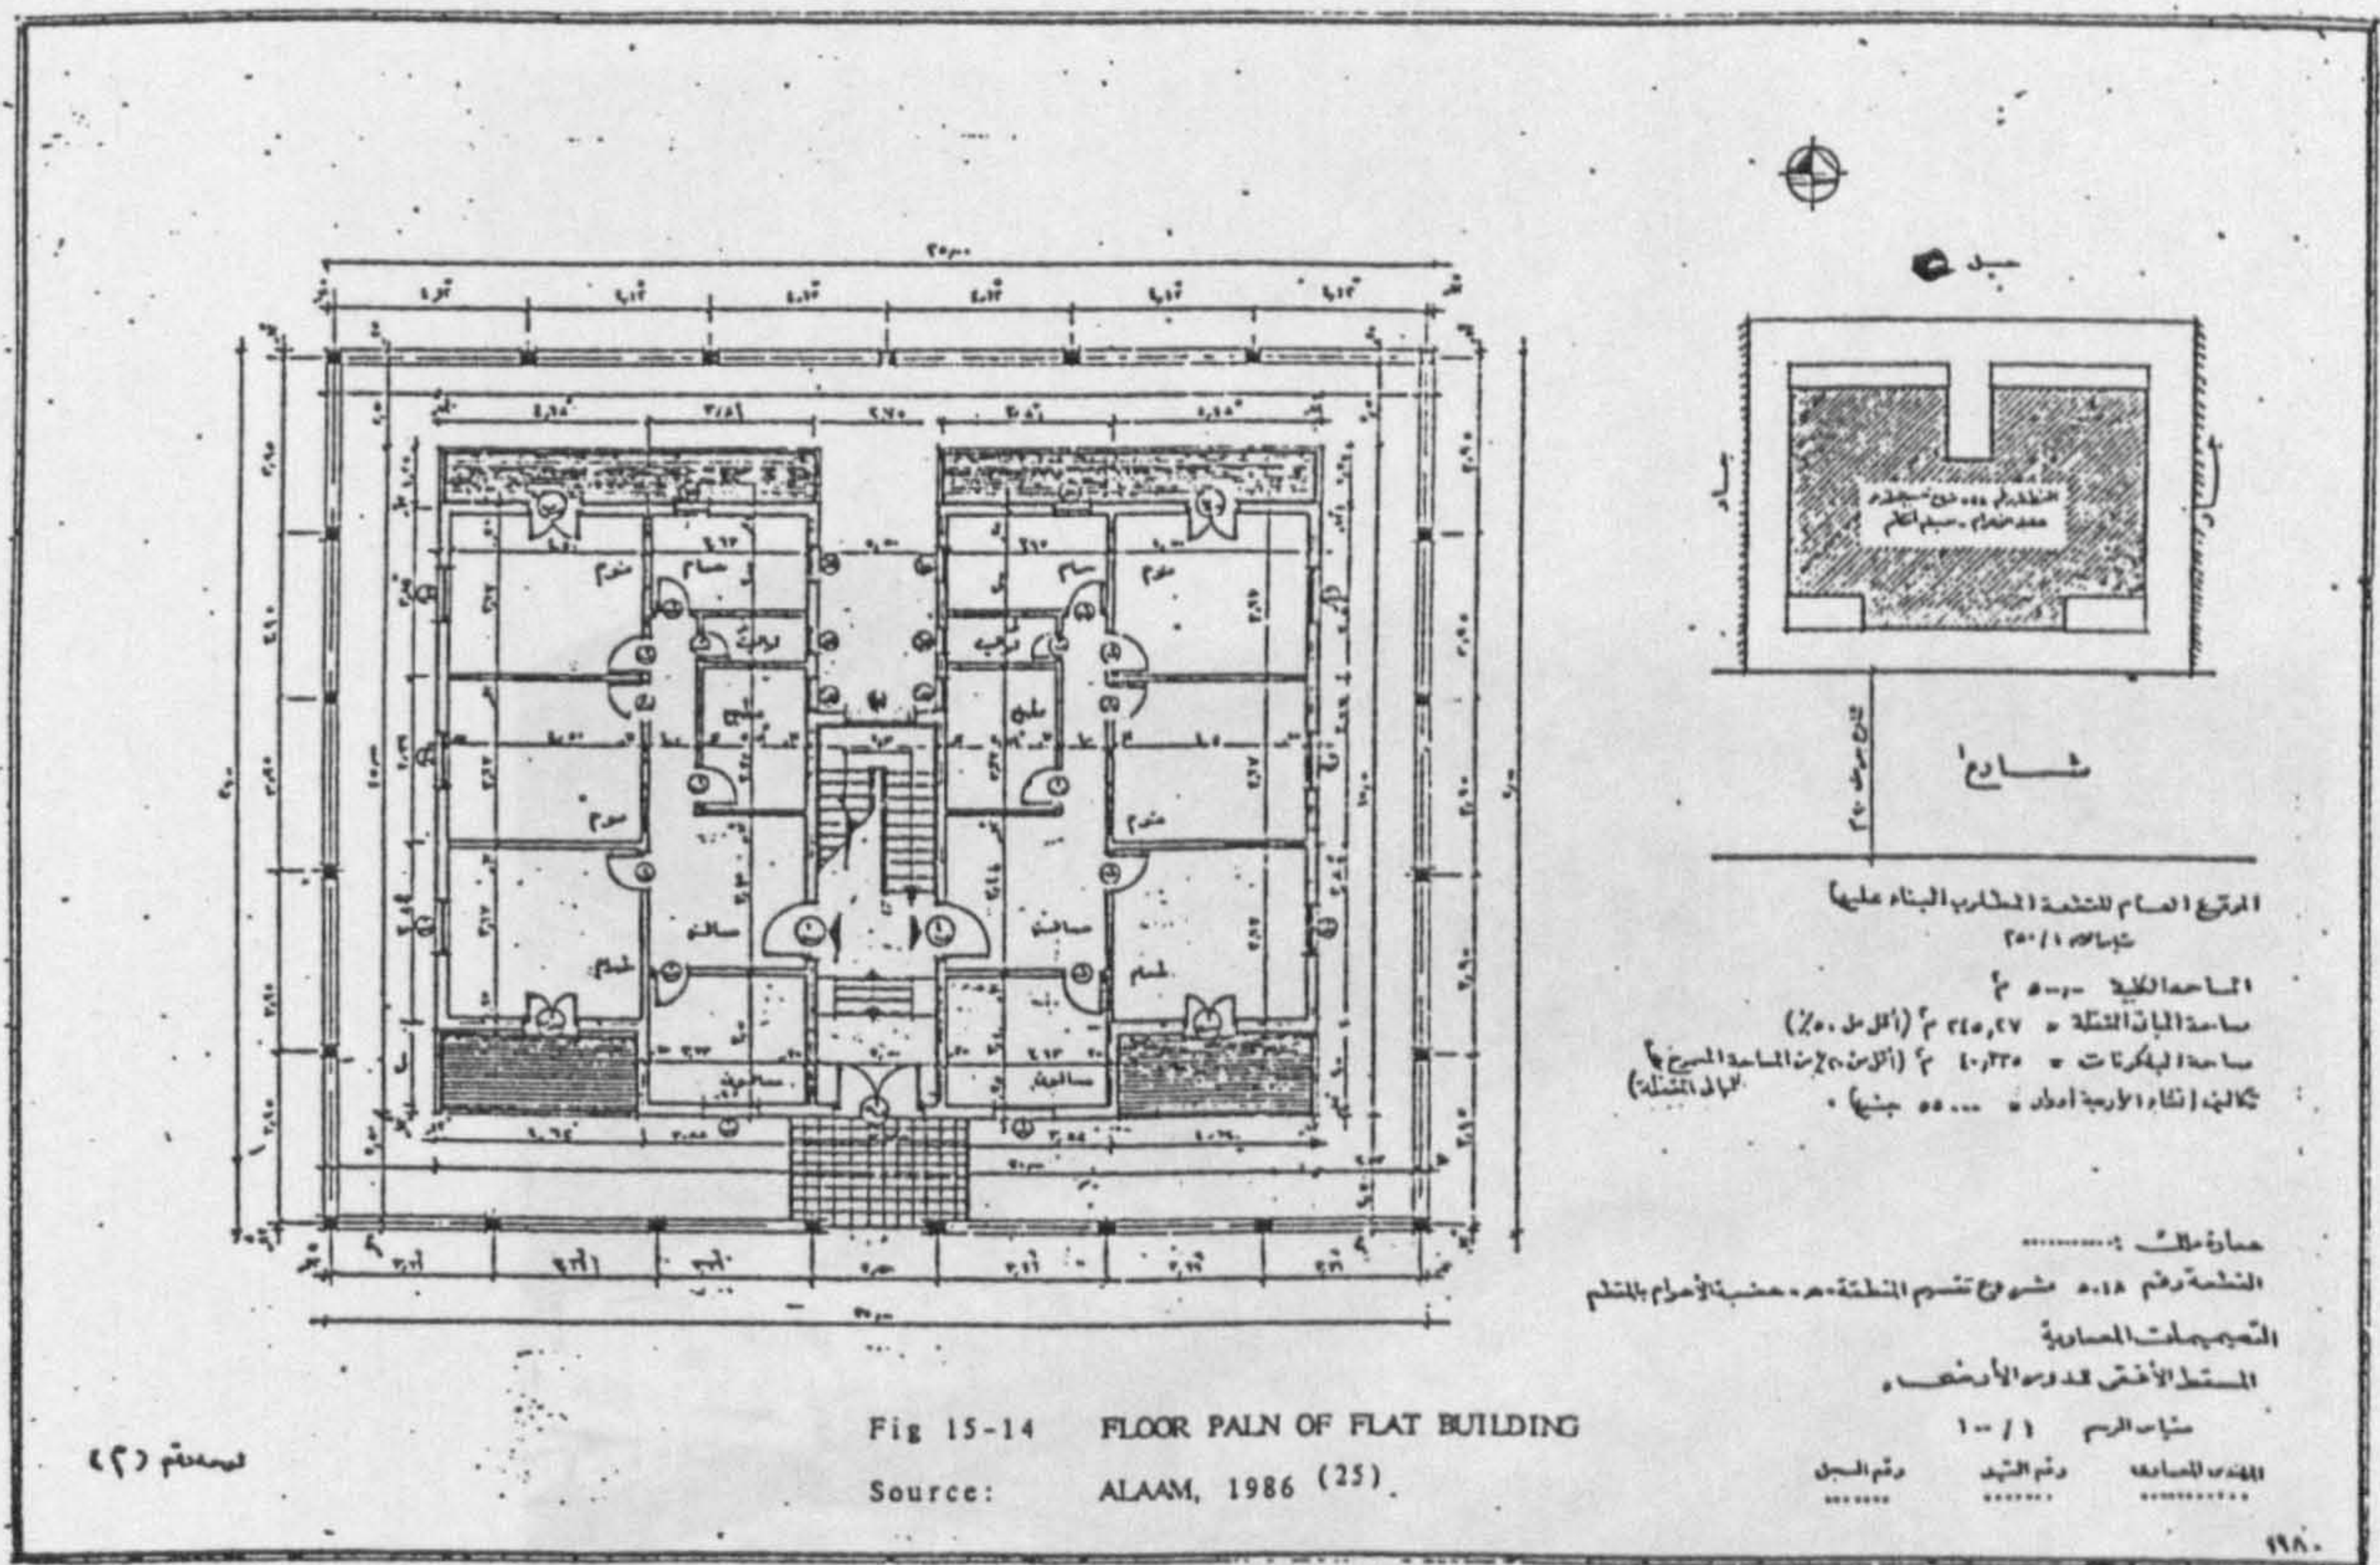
FLOOR PLAN OF FLAT BUILDING
